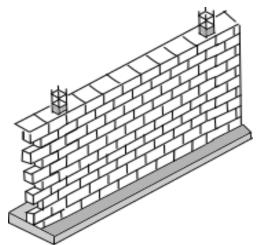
Masonry wall with vertical tie beam (By Author)
